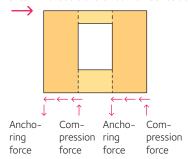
Force equilibrium using simplified method for stabilising wall panel with opening.
